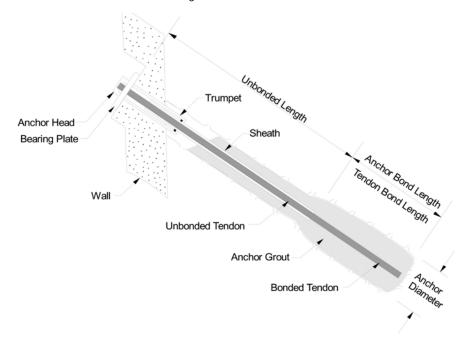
Ground Anchor Cross-Sectional View.
